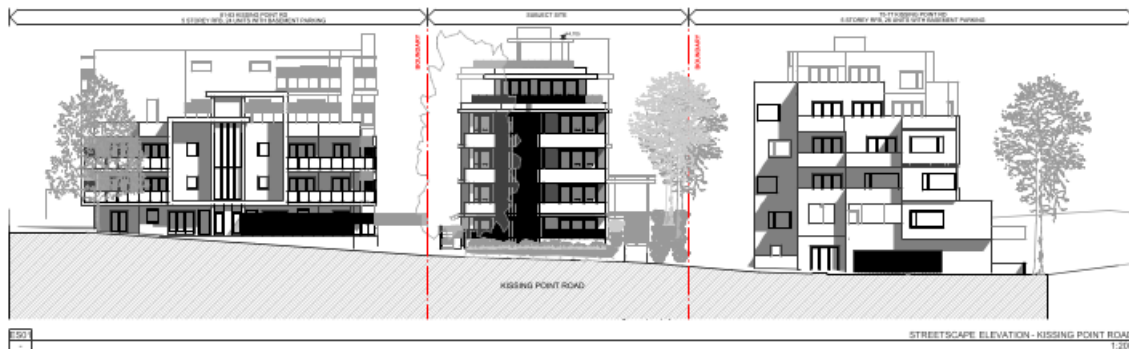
Elevation from Kissing Point Road. Source: Texco Design
